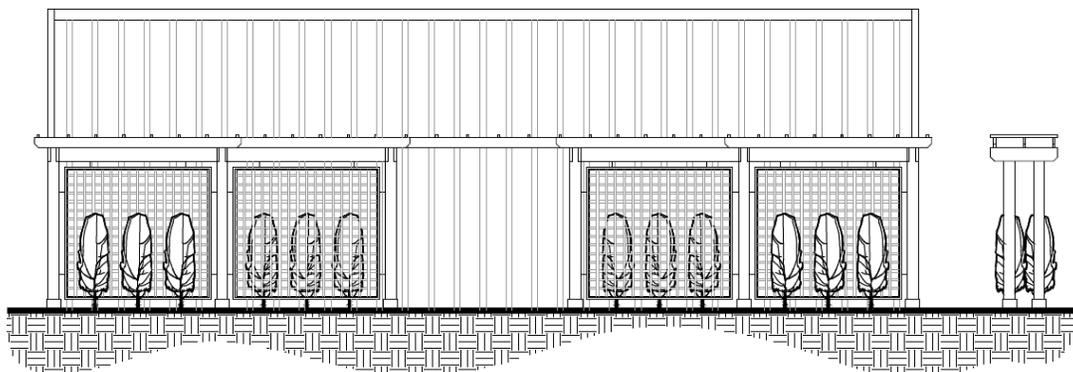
East side elevation; as seen from undeveloped lots designated for future multi-family and mixed use residential development
